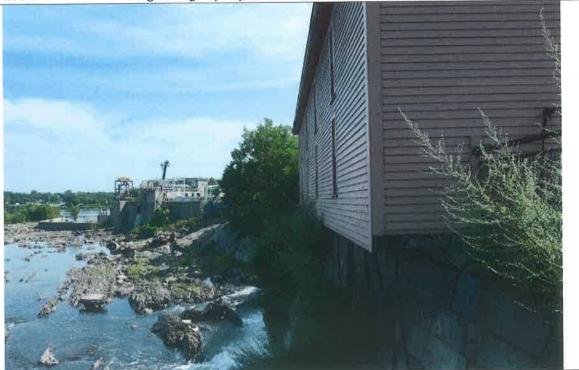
Deteriorated heavy timber ledger and wall sill plate at eastern end of south wall.
